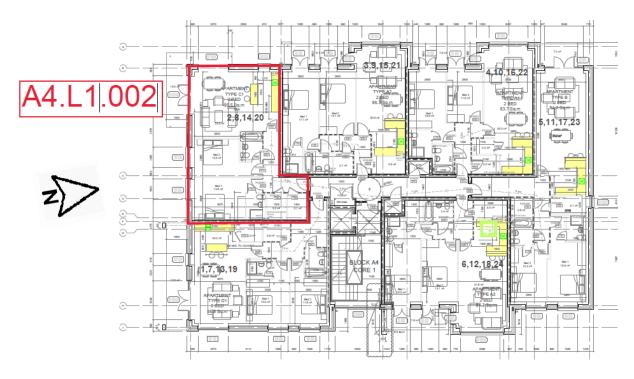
Floor Layout of the Existing Block A4 (Bridgefield) – First Floor
